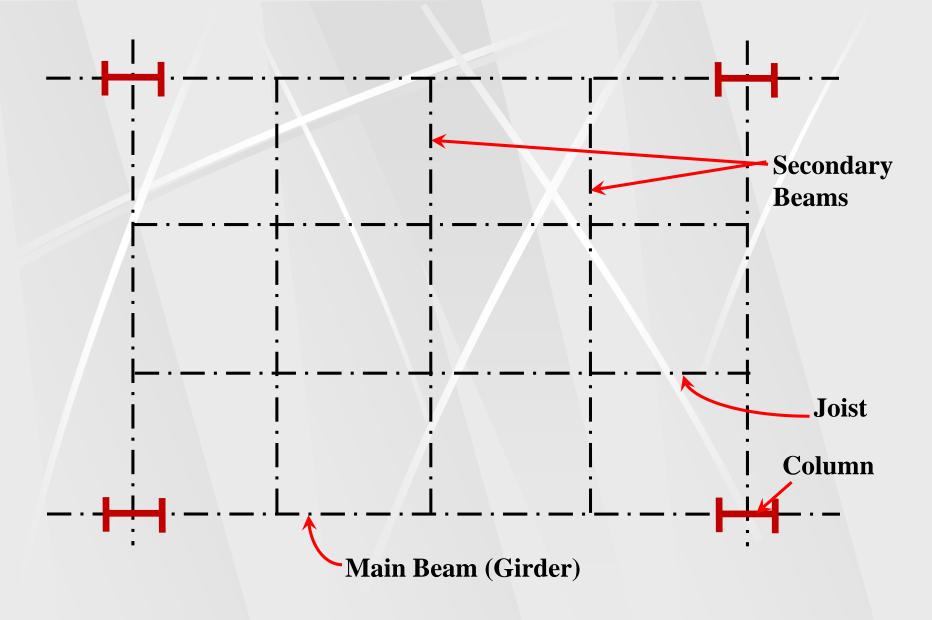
Typical Plan of a Building Showing Layout of Columns and Beams
